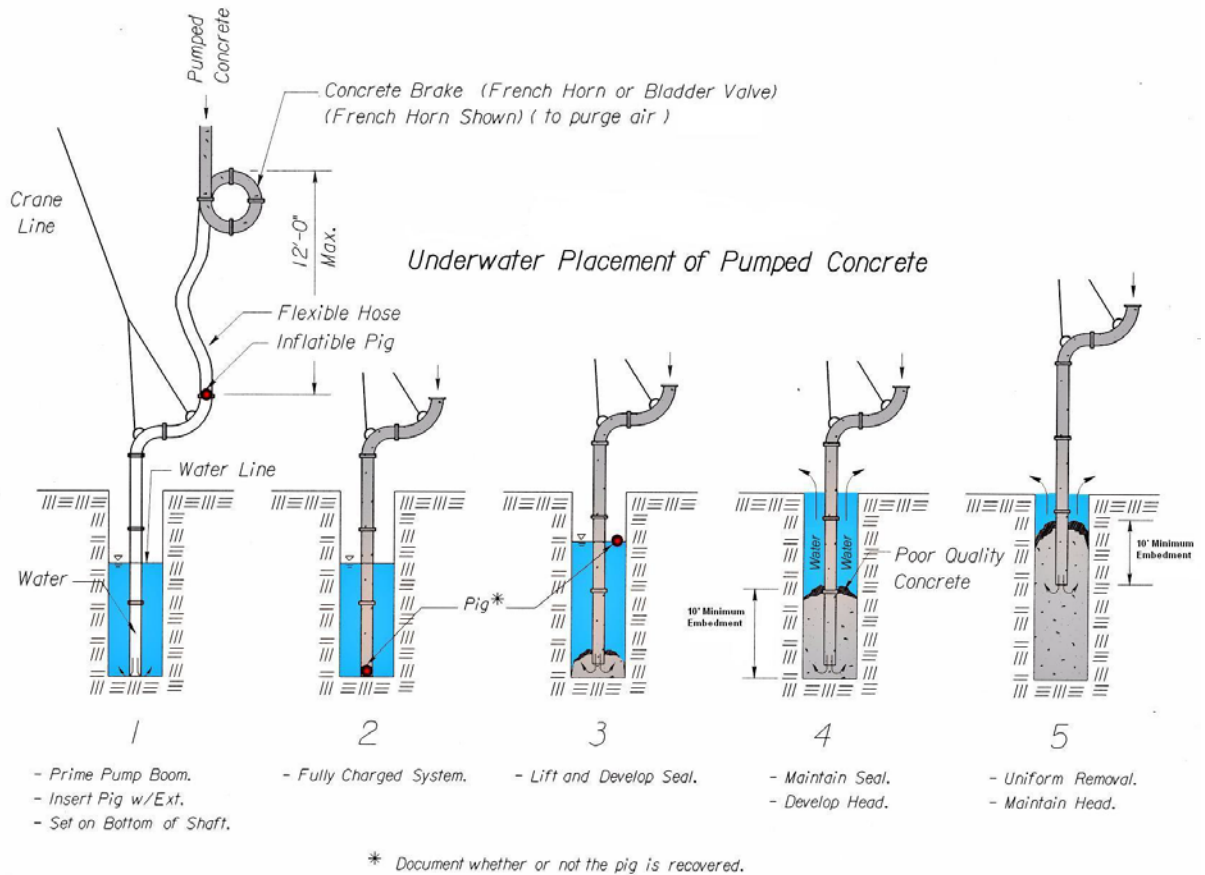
Underwater Placement of Pumped Concrete (KDOT 2008)
